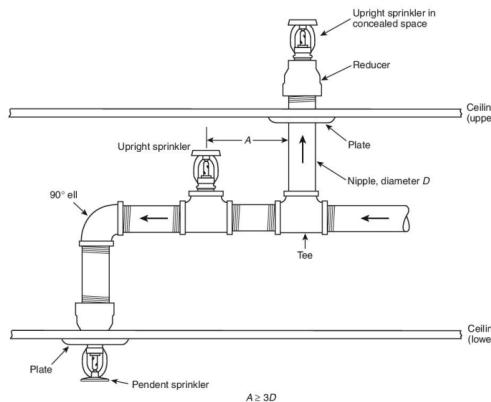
(c) Arrangement of Branch Lines Supplying Sprinklers Above, Between, and Below Ceilings.
